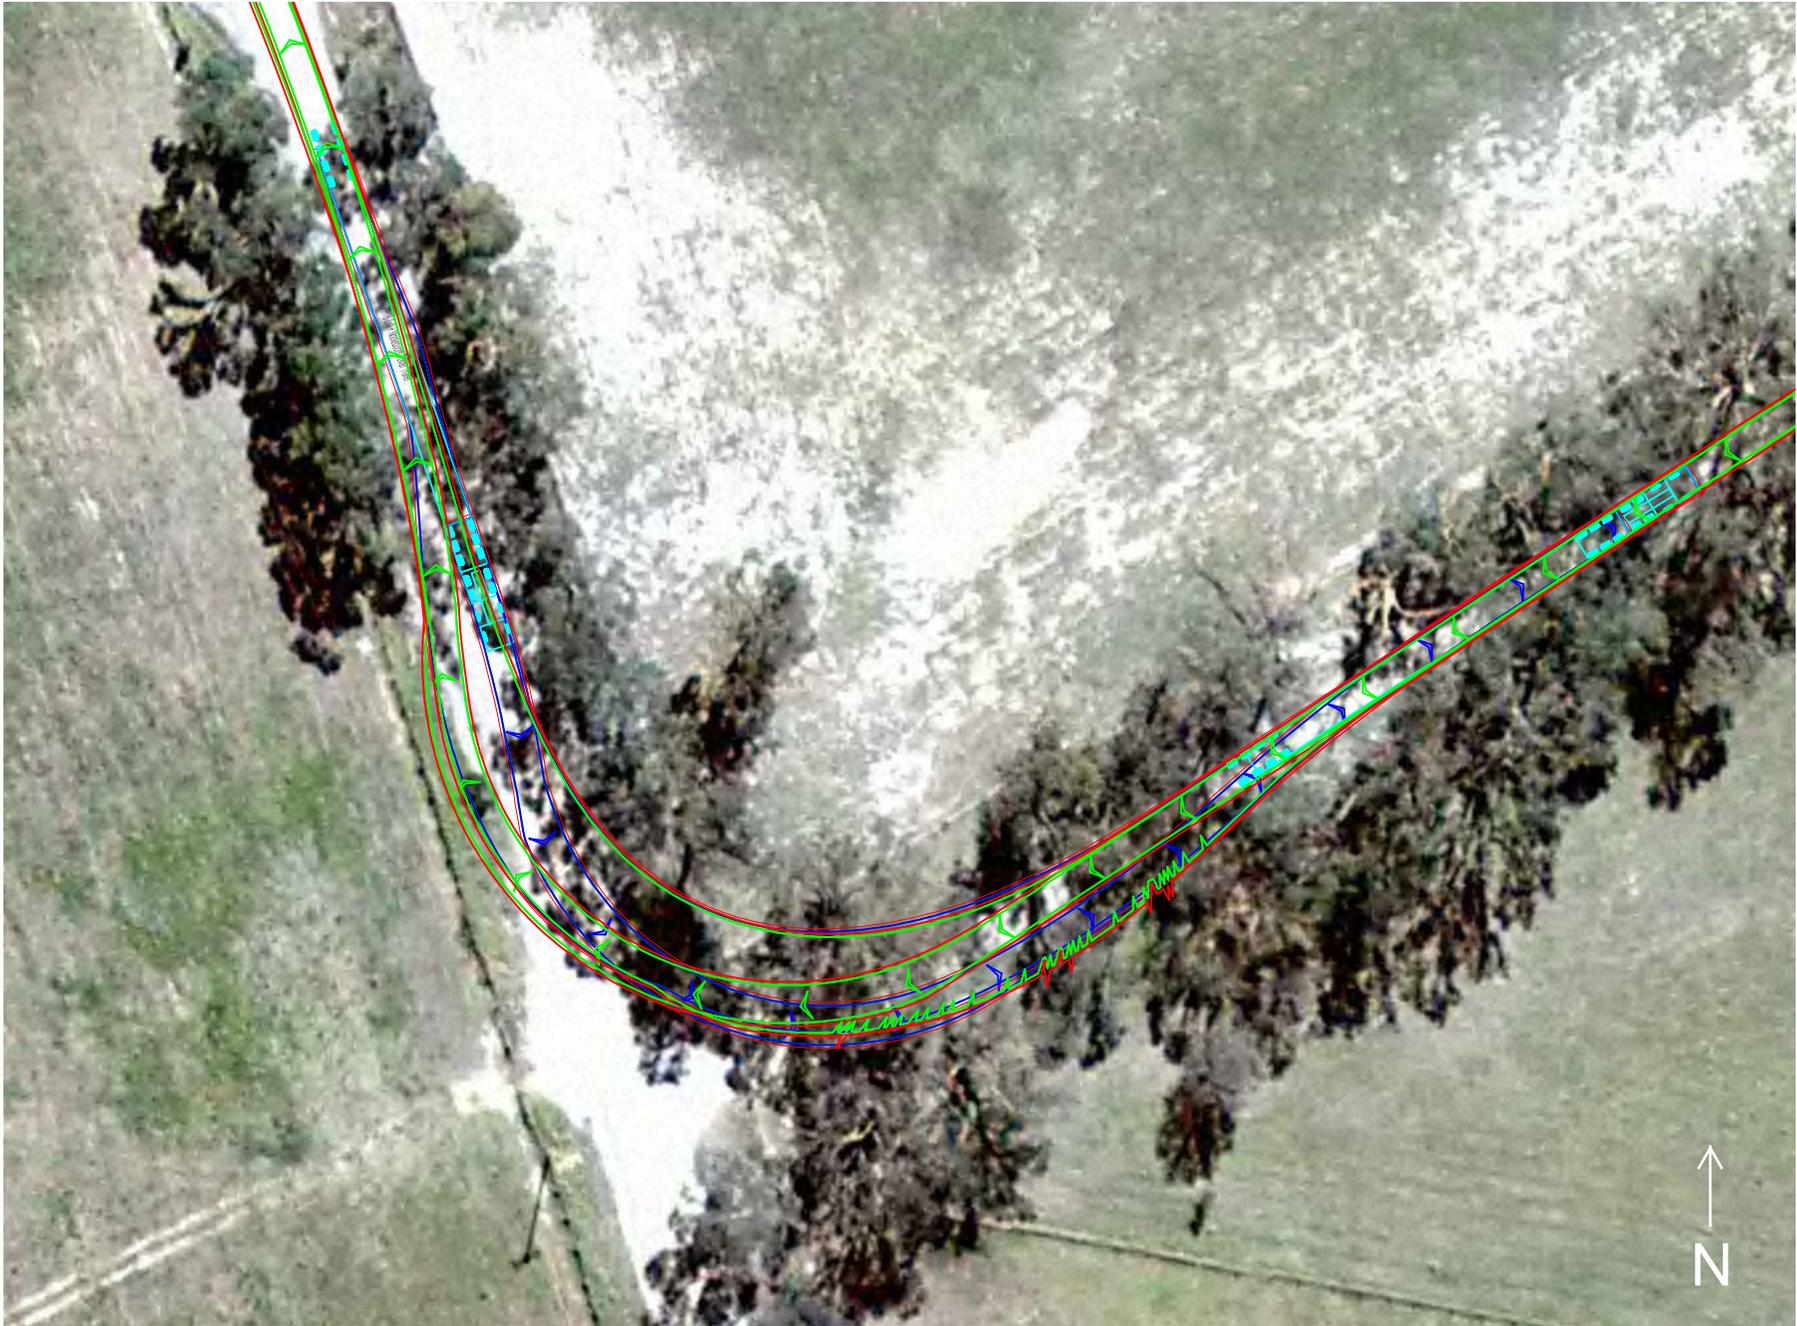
Halls Road / Errowanbang Road intersection blade transport vehicle swept path
